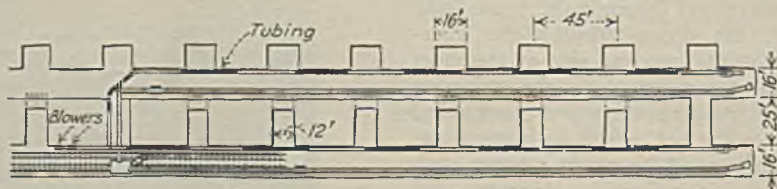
Details of entry-driving system using cross conveyor to bring all coal to one loading point
